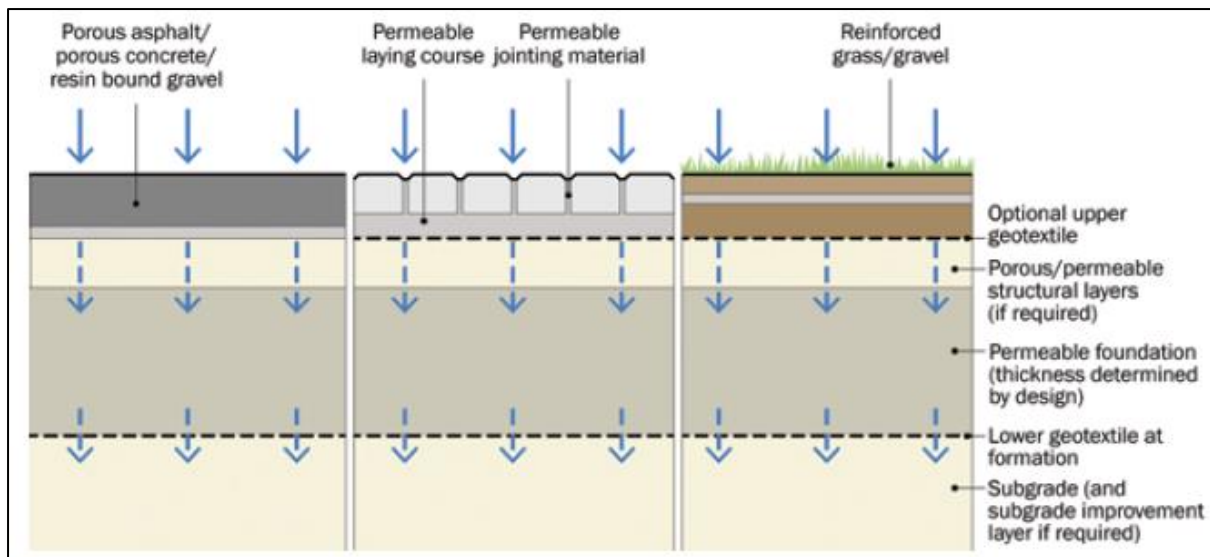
Typical Section of a Permeable Pavement – Type A (Total Infiltration) (Source: SuDS CIRIA Manual)
